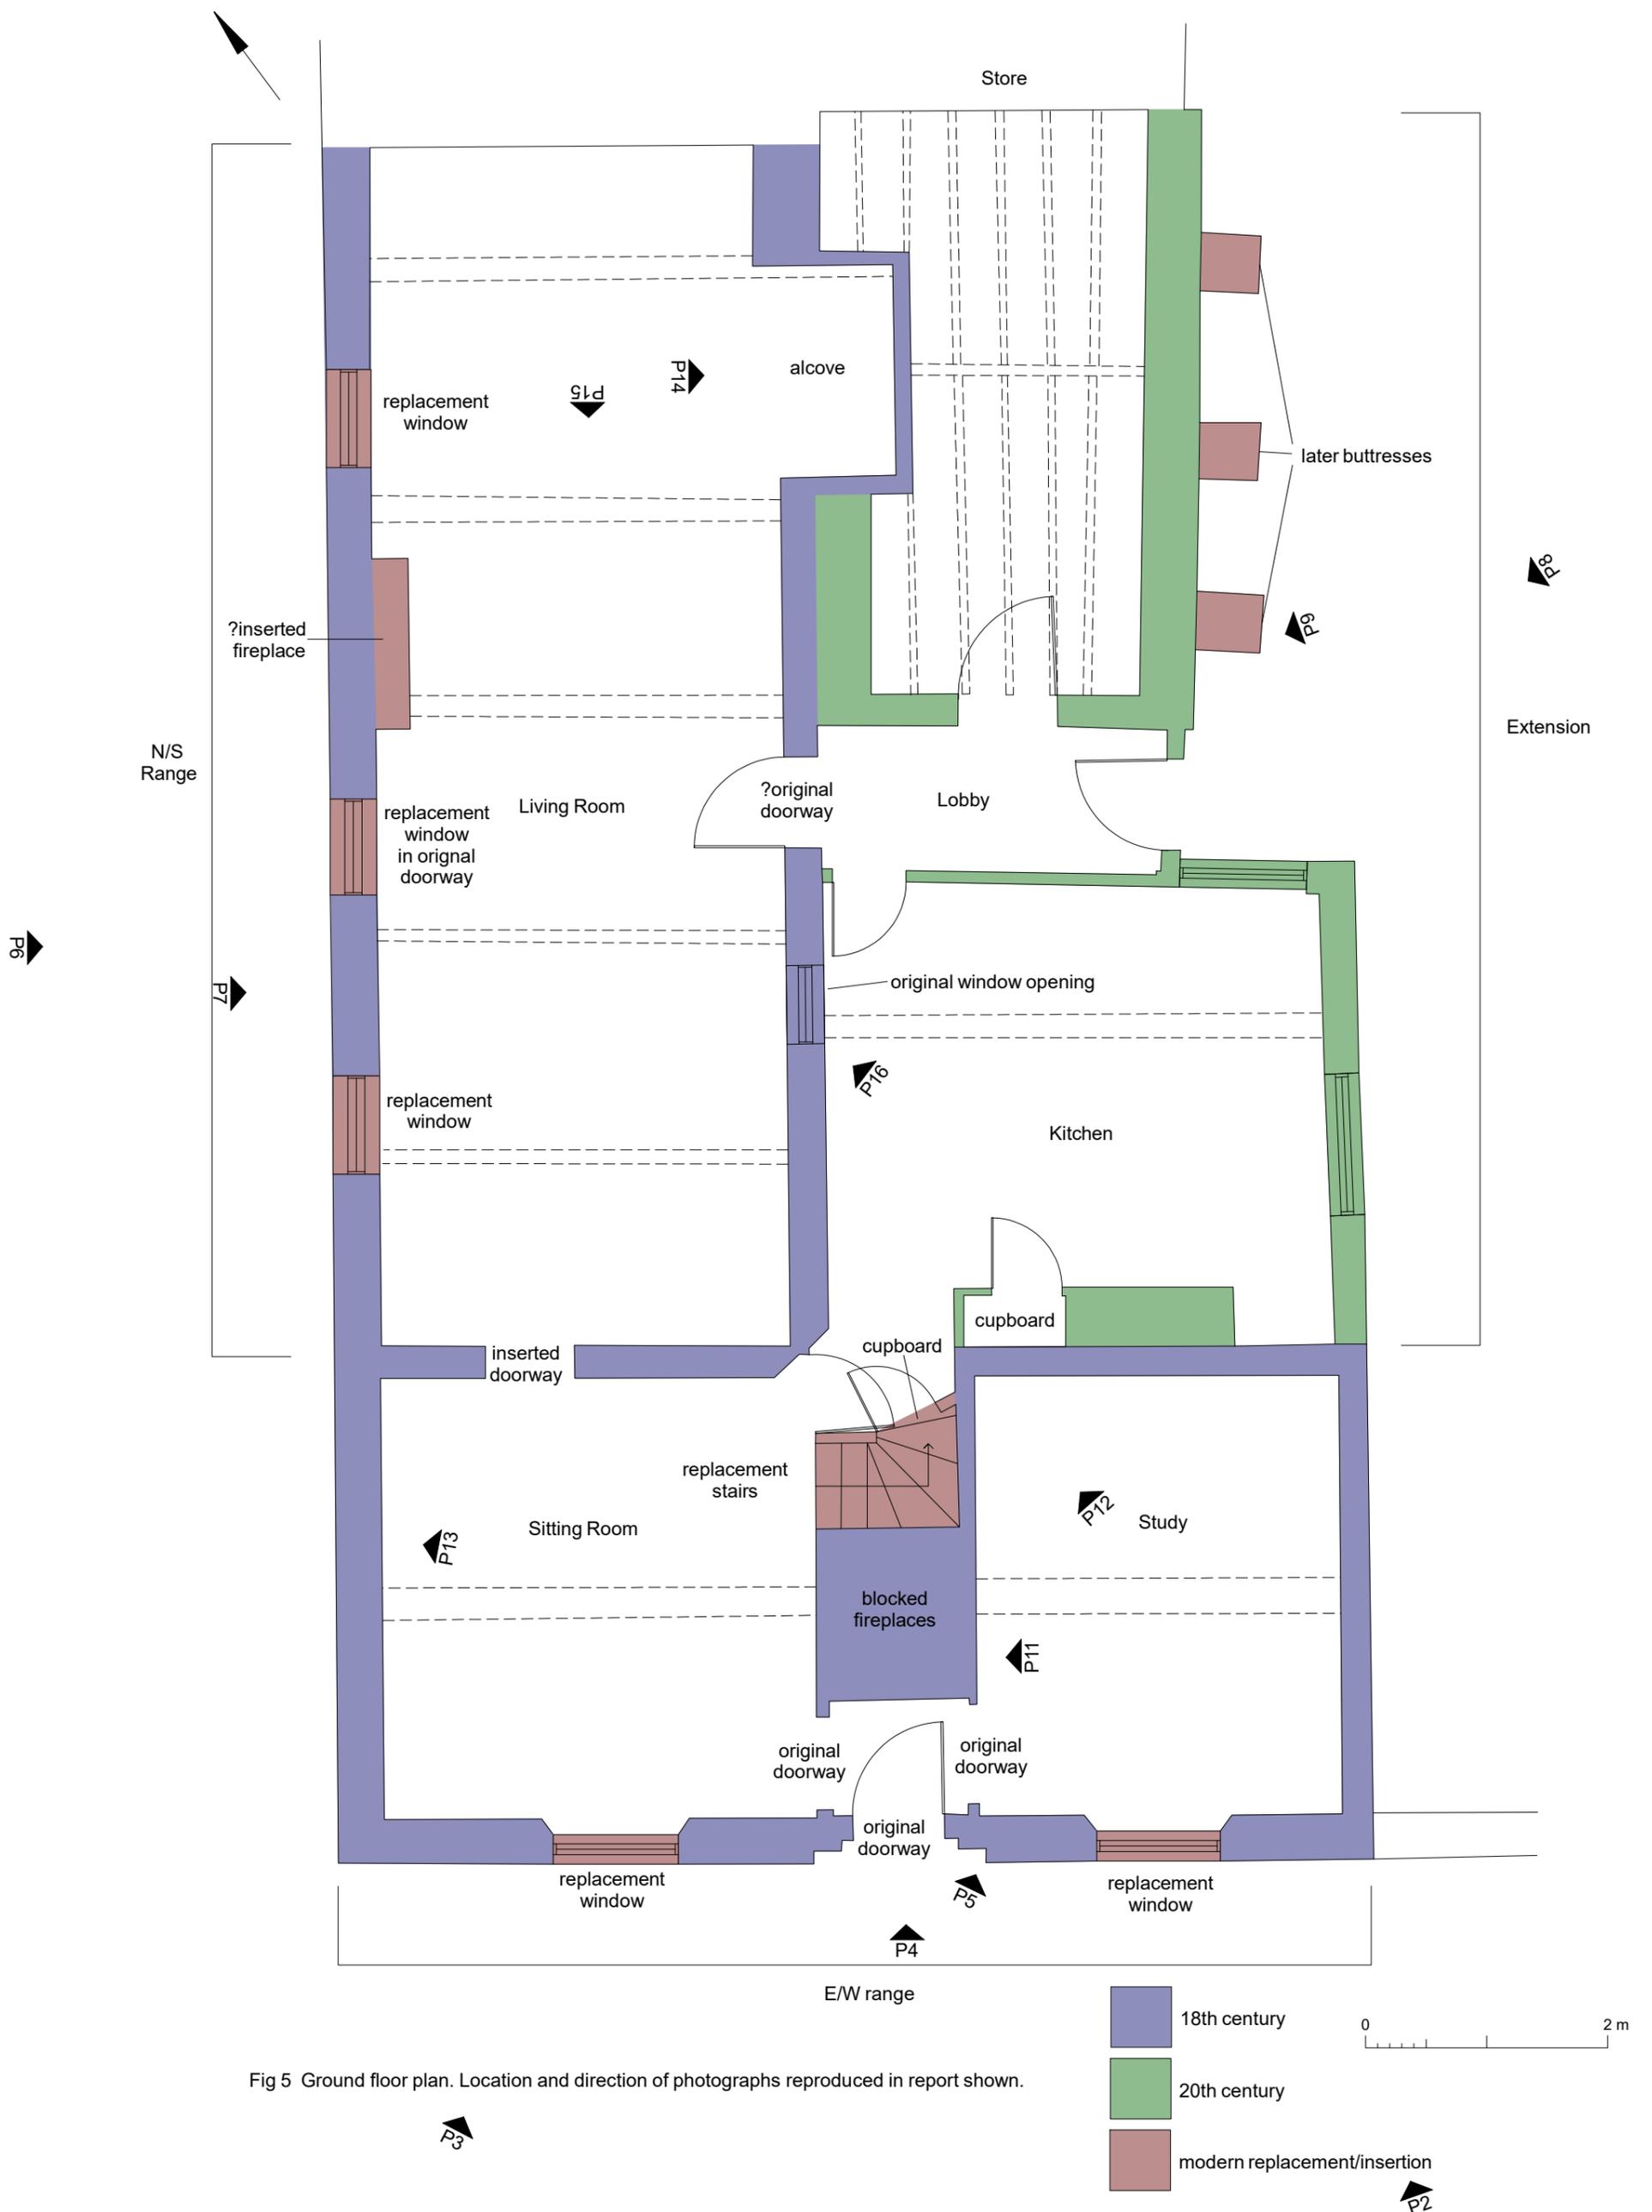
Ground floor plan. Location and direction of photographs reproduced in report shown.
